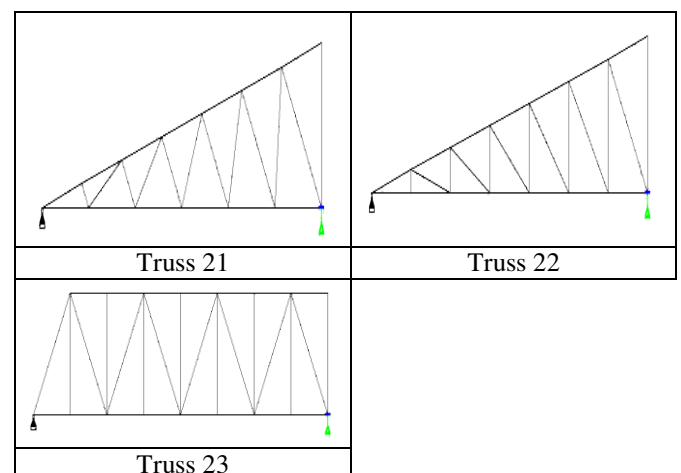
Nonsymmetrical trusses [Truss 21 to Truss 23]
